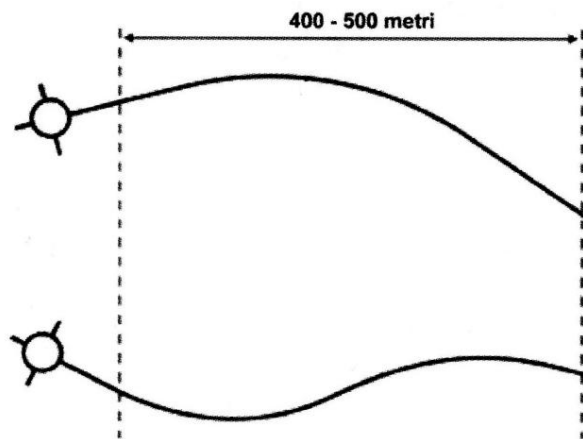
An example of profiling of the entrance branches to a roundabout
